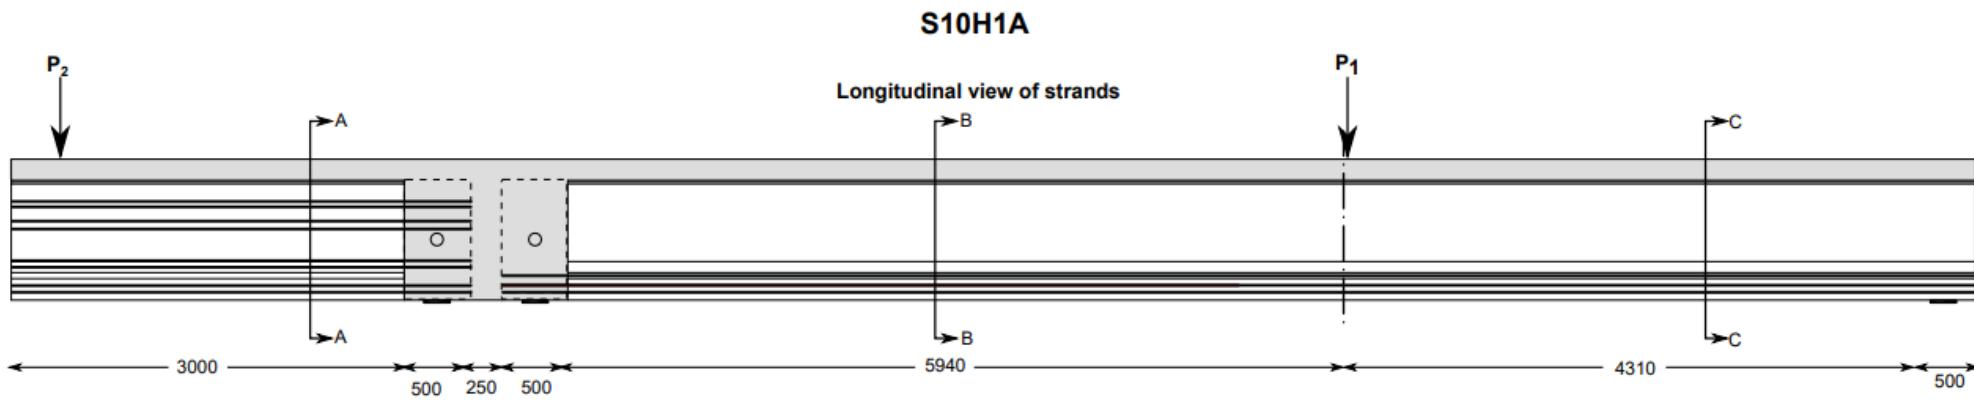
Construction stages of the specimens (All dimensions are in mm)
